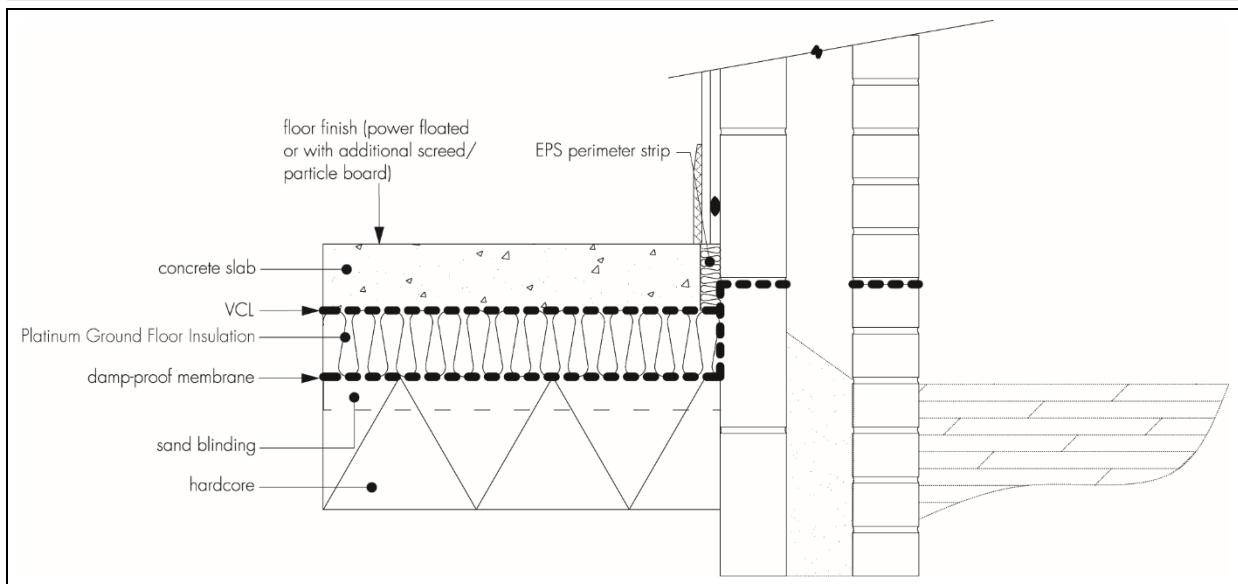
Typical installation details — under concrete slab (dpm under insulation)
